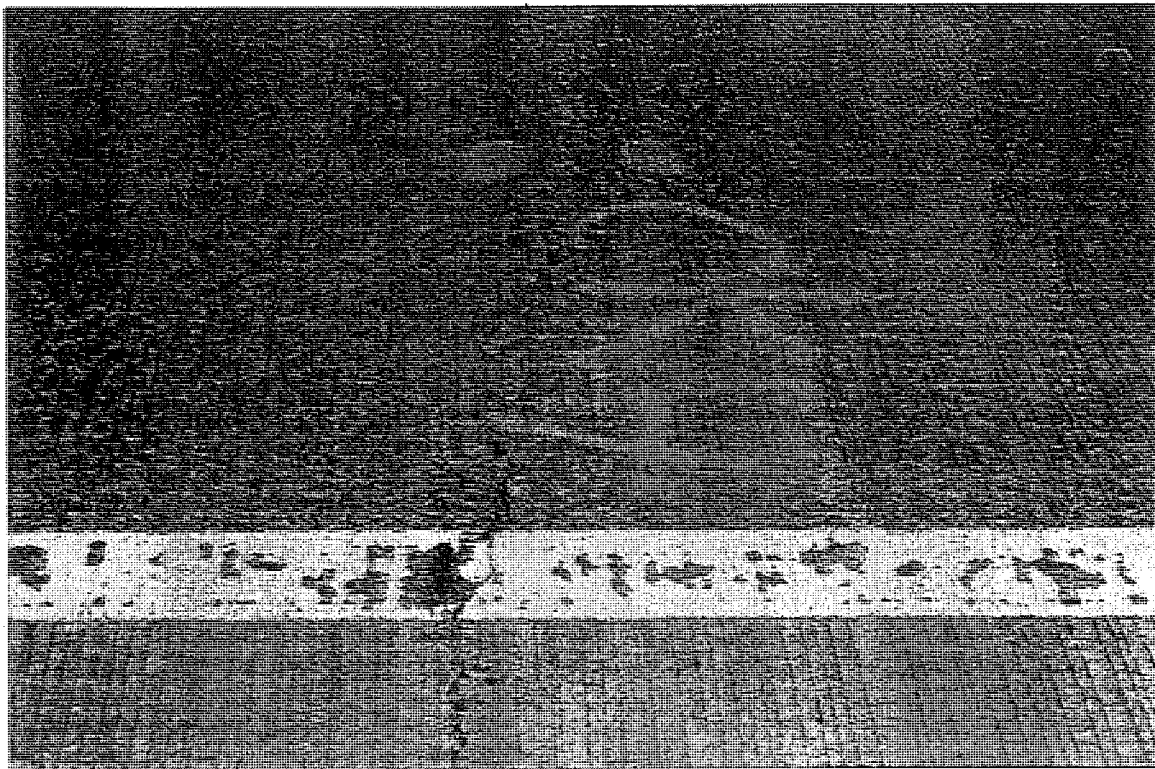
A typical midslab crack on CSN# 11017-32516A (Section A), EB. The beginning of some spalling can be seen at the bottom of the photo.
